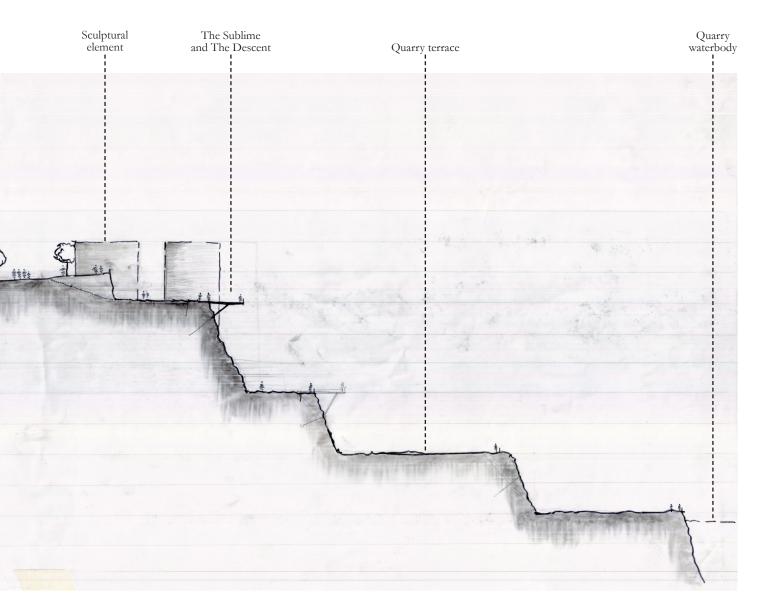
Section through exploration of sketch plan area. Not to scale (Author 2019)
